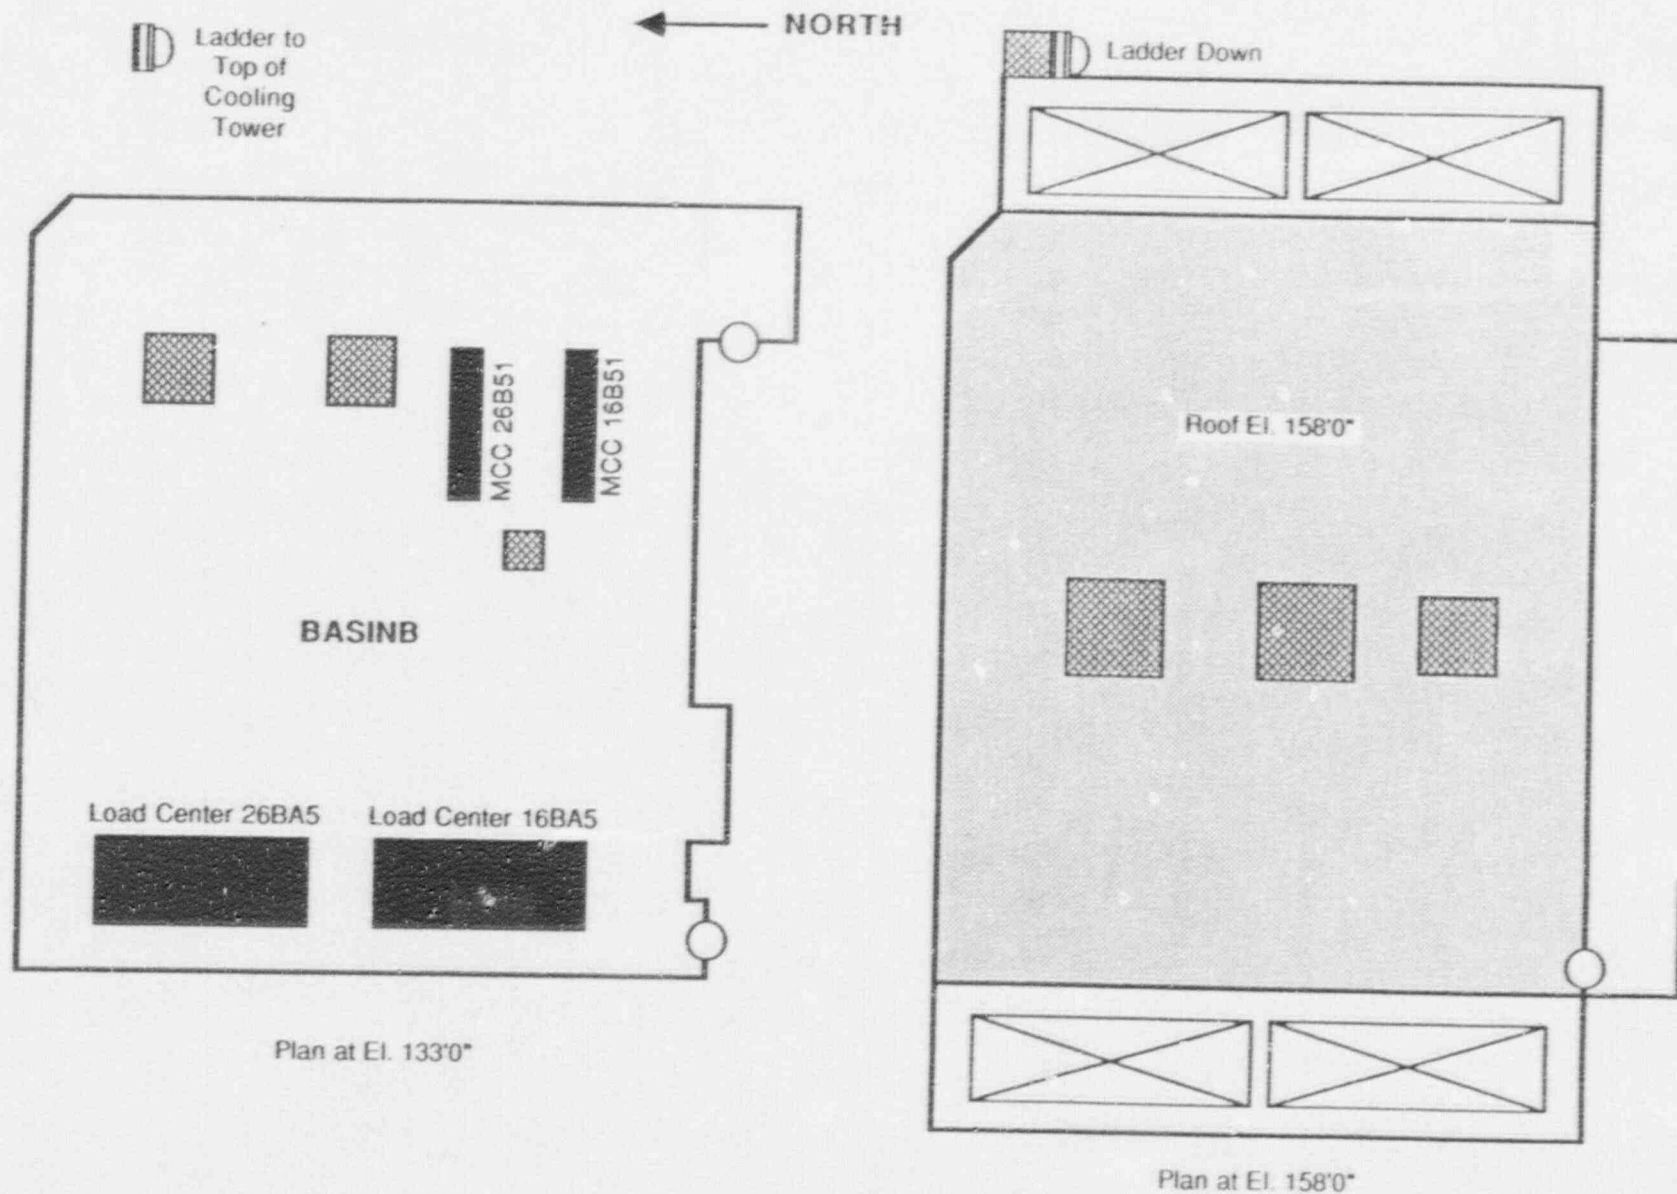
Grand Gulf 1 Service Water Cooling Tower Pump House B (Elevations 133'0" and 158'0")
